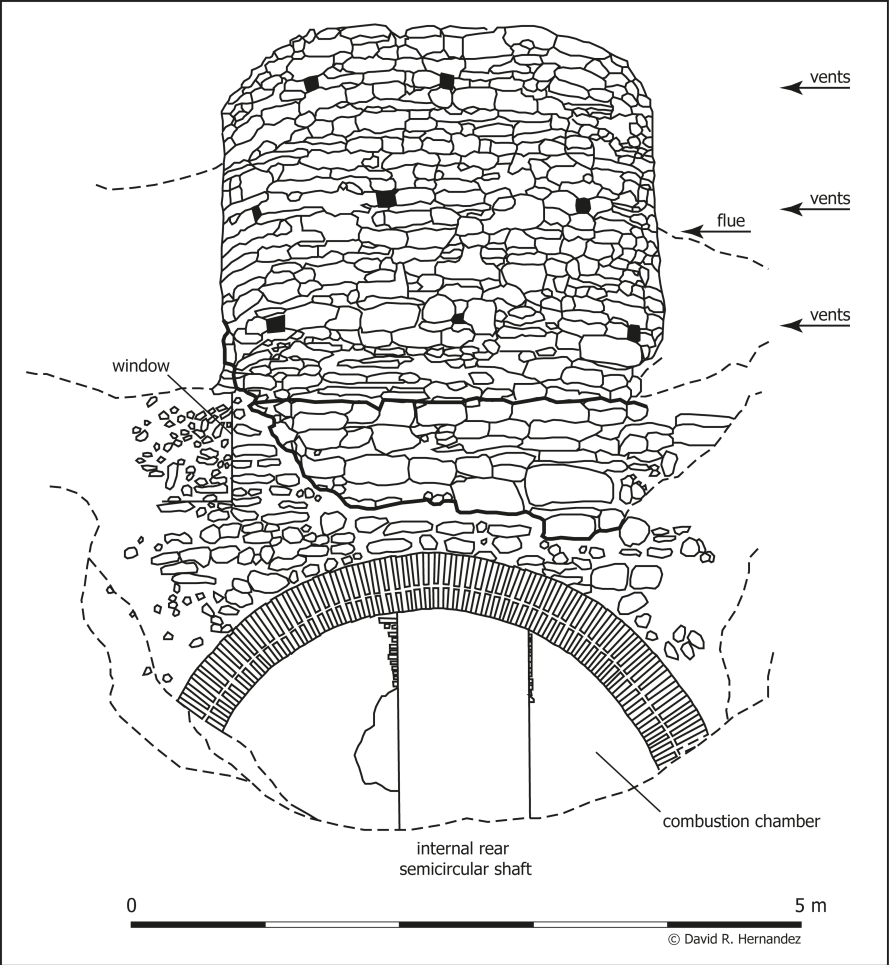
Lime-kiln elevation (drawing by Anna Biller, Roman Forum Excavations Project).
